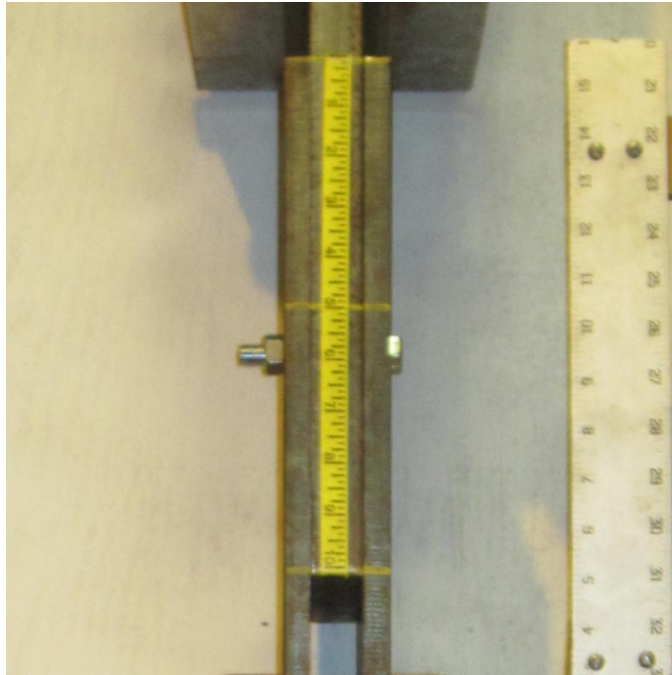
Typical Joint Configuration 1, Bolted, Double Shear Specimen.
